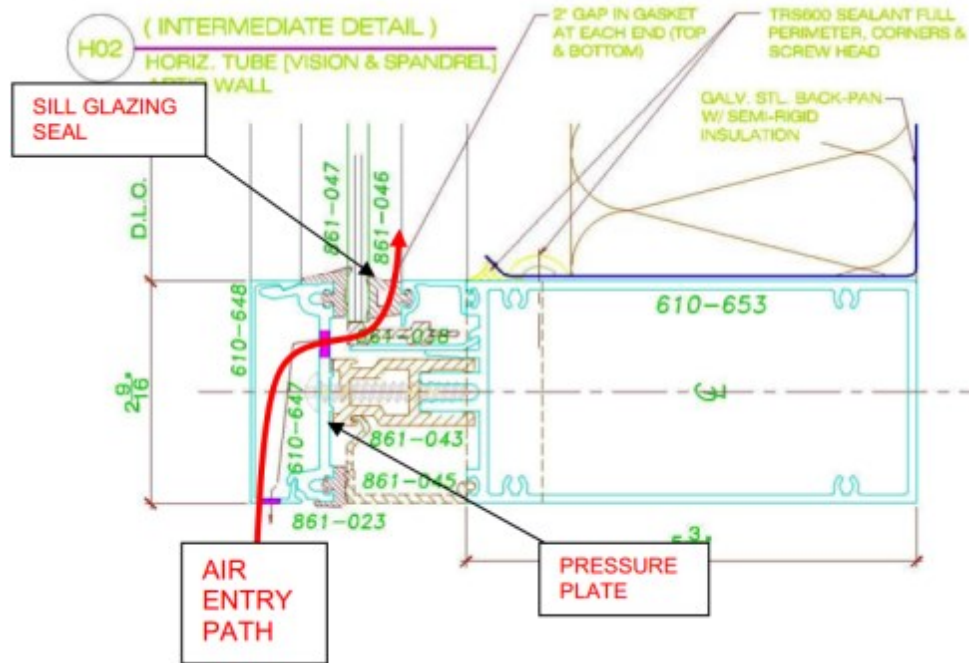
An example of an air inlet system in a curtain wall (Richman and Pressnail, 2010).
